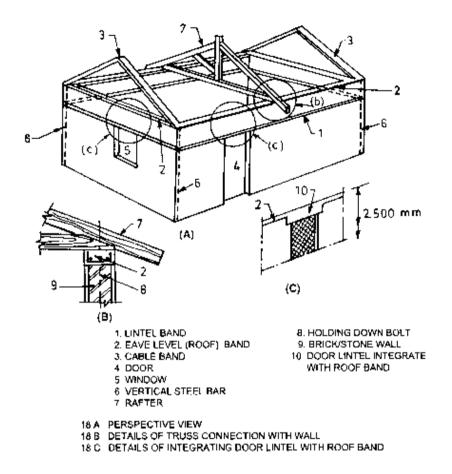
OVERALL ARRANGEMENT OF REINFORCING MASONRY BUILDING HAVING PITCHED ROOF
